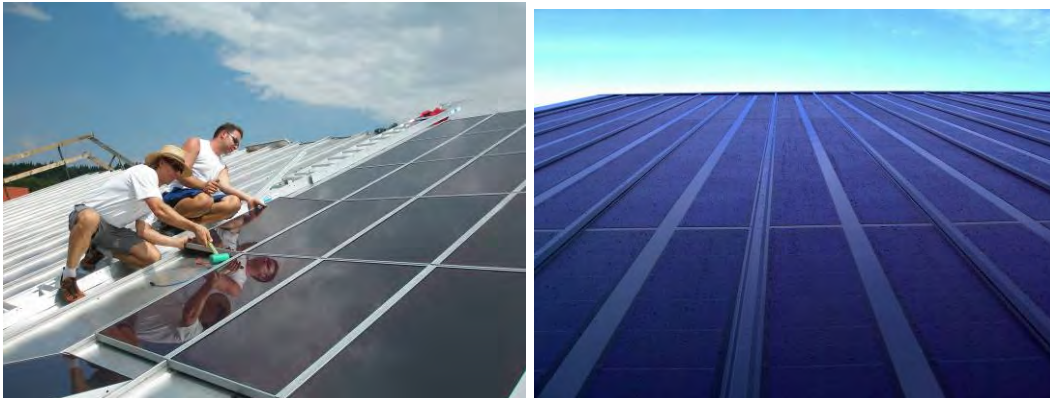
Stainless steel roof element with installation of photovoltaic modules (Rudolf Schmid, left). Photovoltaic roof element on the basis of galvanized steel (Hoesch-Contecna, right).
